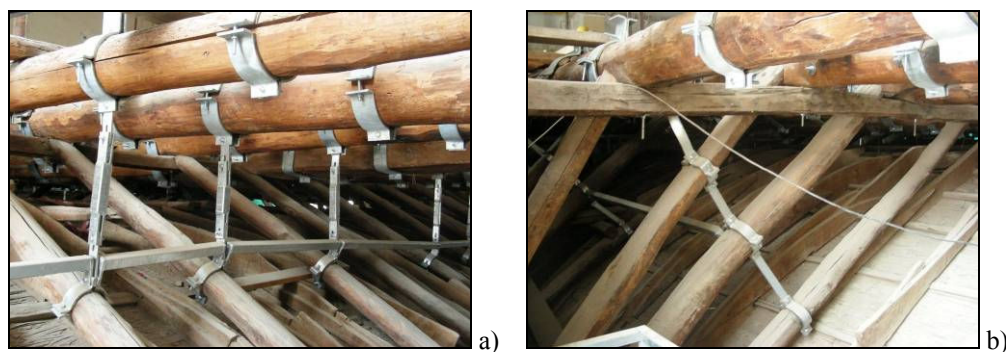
Diplomatic Hall (II) – Retrofitting interventions – Stiffening systems for struts:
